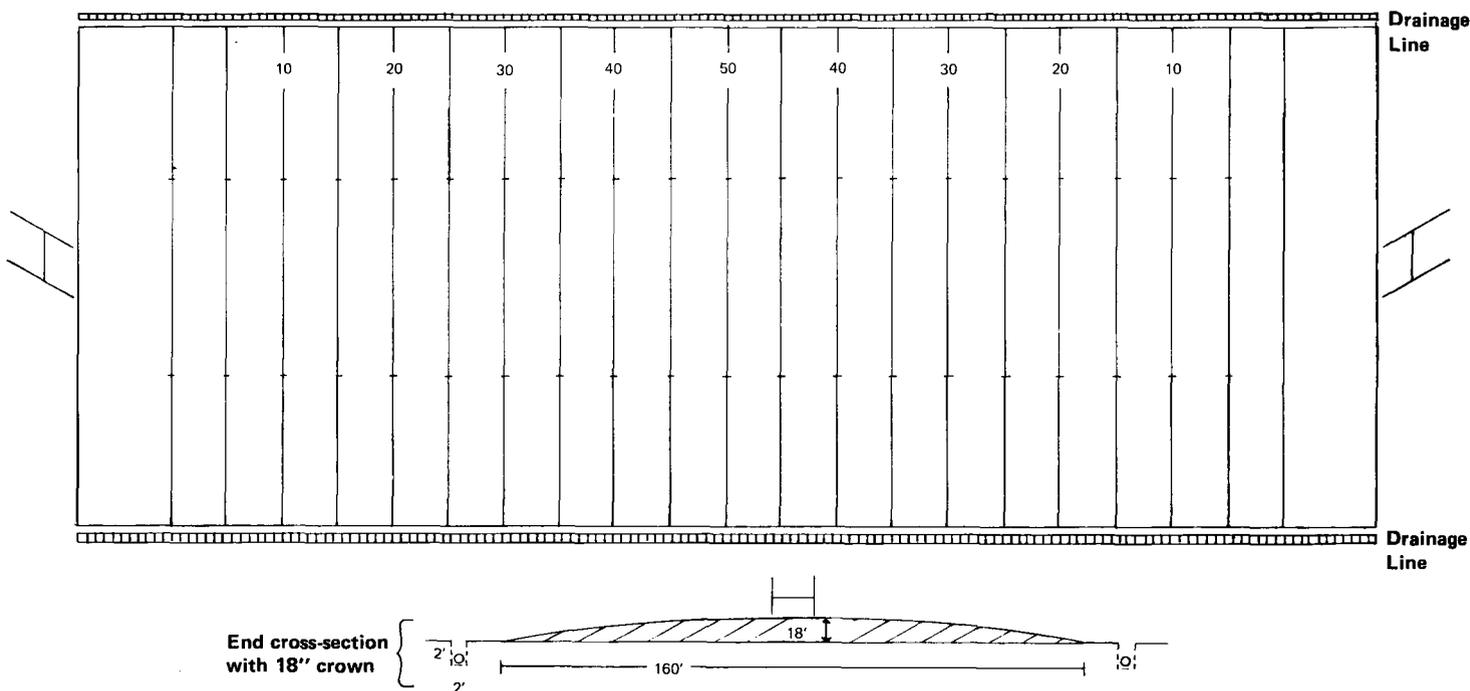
Diagram of a football field with plans and elevations for surface drainage and drainage lines.
